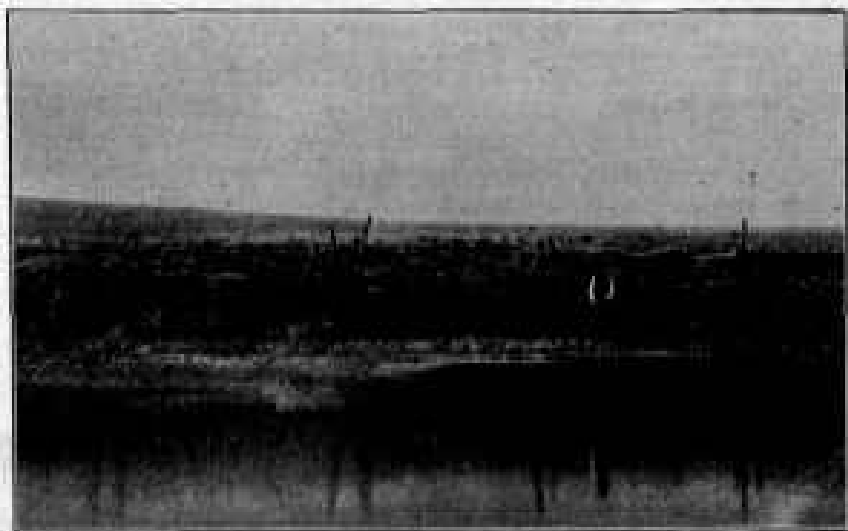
Reservoir slope protected by brush and timbers, Five Mile, Mont.
